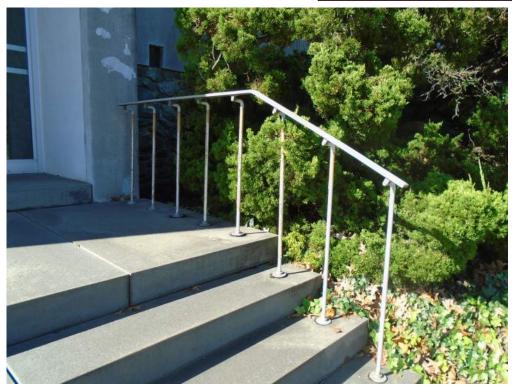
Detail view of the double-height entrance at the east elevation of the 1971 addition. Looking west.
